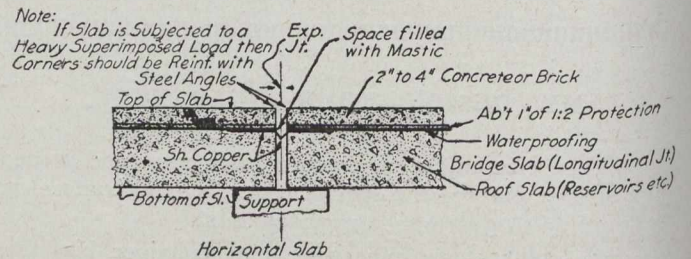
Waterproofed Expansion Joints for Plain and Reinforced Concrete Slabs.
